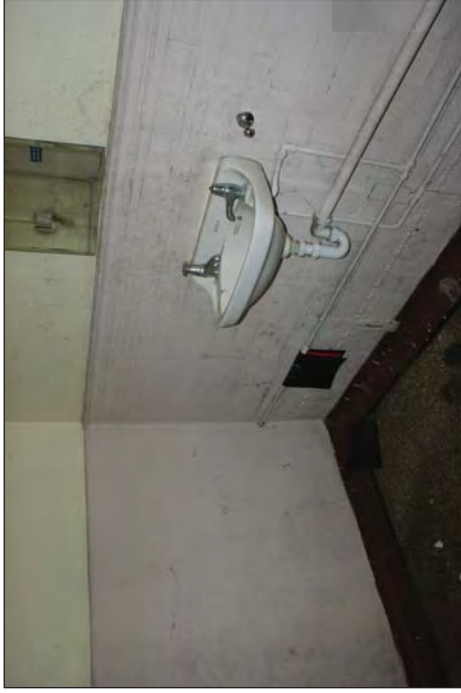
(Top). Ground Floor Staff Bathroom. Room Has Been Repainted but is Otherwise as It was Built and Laid Out in 1919
